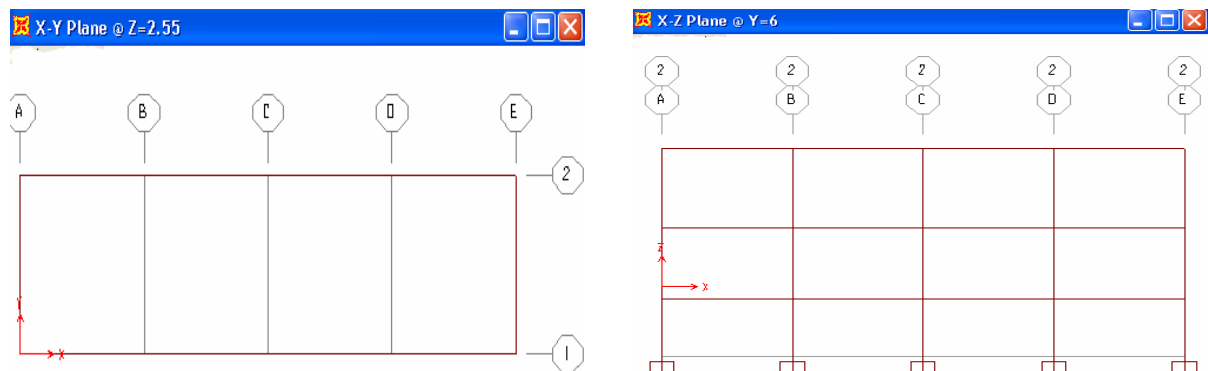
The Plan View of the building at an Elevation of 2.55 m and Side View of the building respectively
